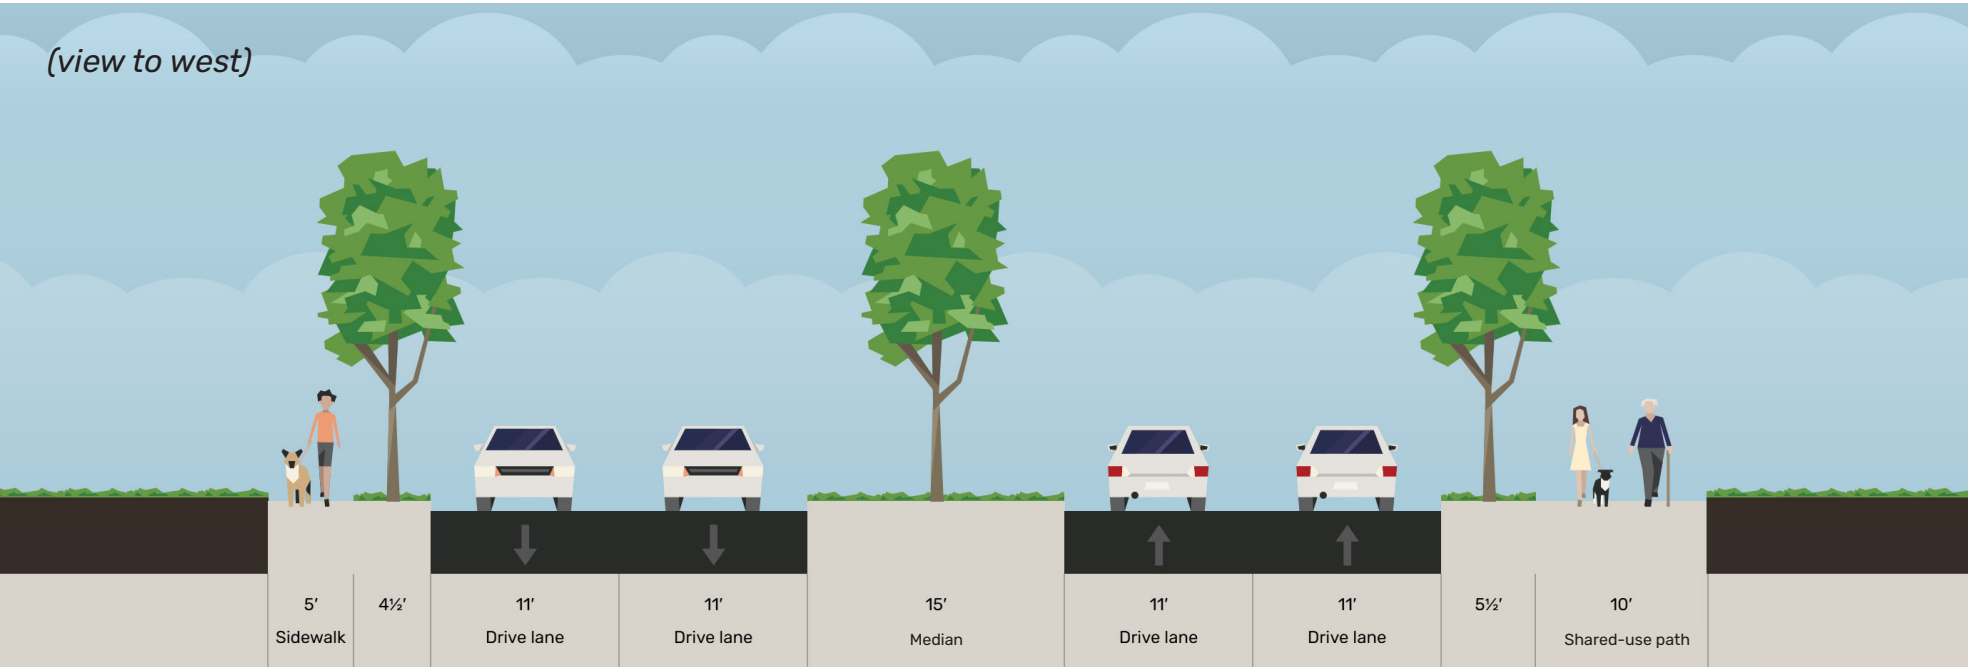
Proposed Typical Cross-Section on Robinson Road (84’ ROW)
